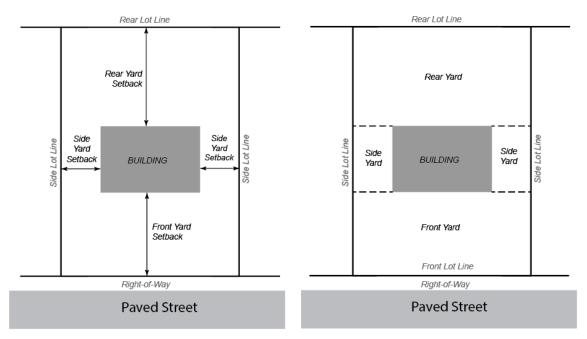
C: Typical lot lines and setback locations for an interior lot (left image) and typical yard locations (right image).
